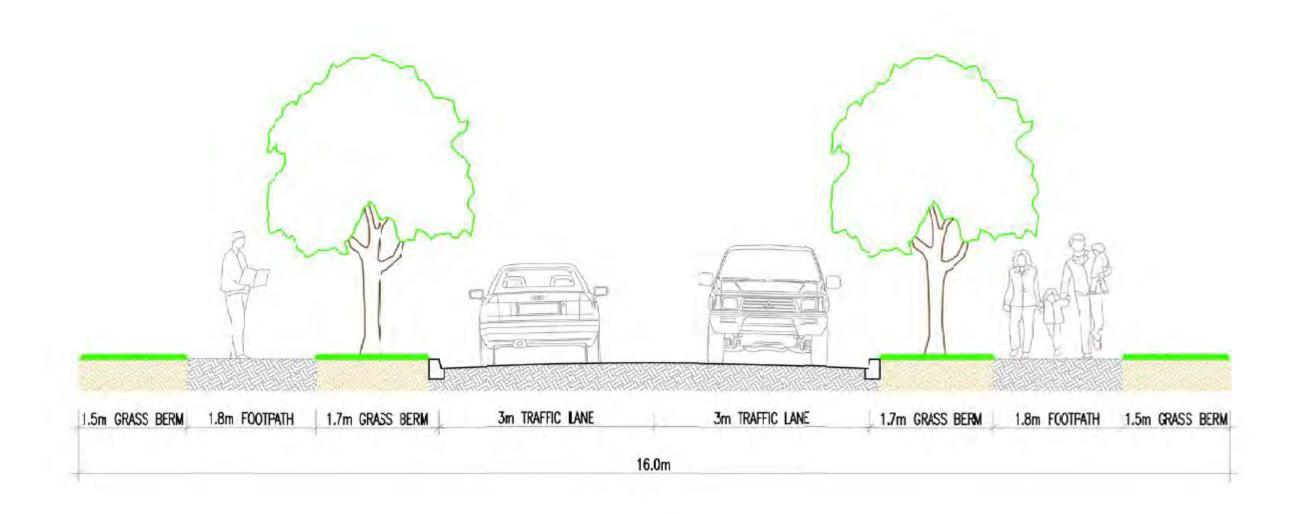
CROWS/BIRDWOOD IMPROVEMENTS
